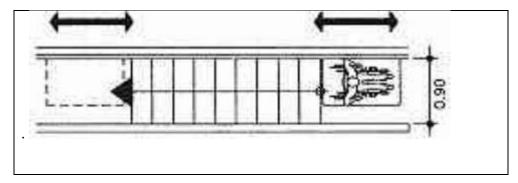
Inclined movement platform installed along a stair wall (Source: SOLIDERE, 2004)
